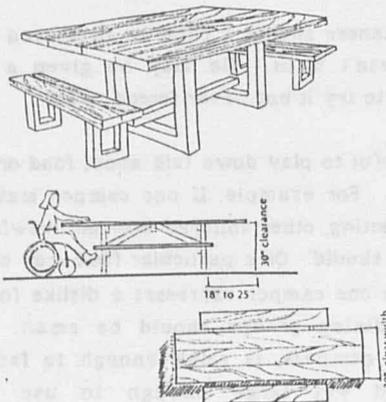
U.S. Department of the Interior, A Guide To Designing Accessible Outdoor Recreation Facilities, January 1980.
